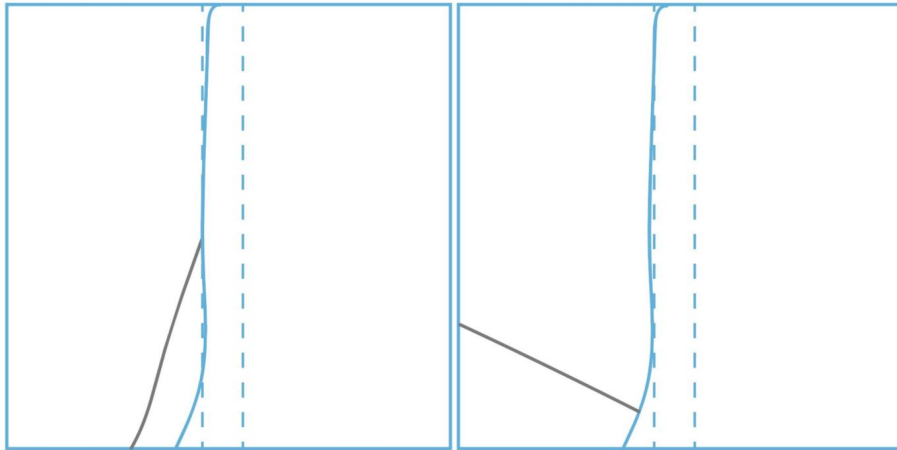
Crack Pattern Two (left) and Three (right) in the flange
